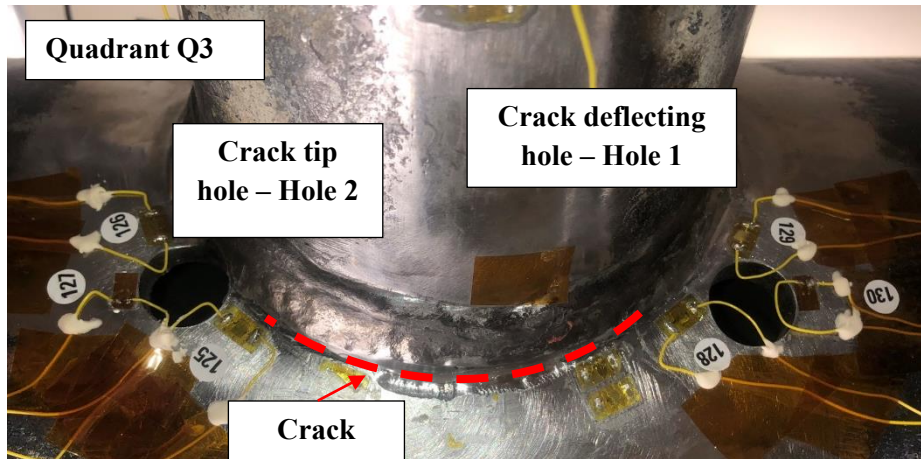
Quadrant Q3 repair, crack-tip hole on the left-hand side and crack deflecting hole on the right-hand side.
